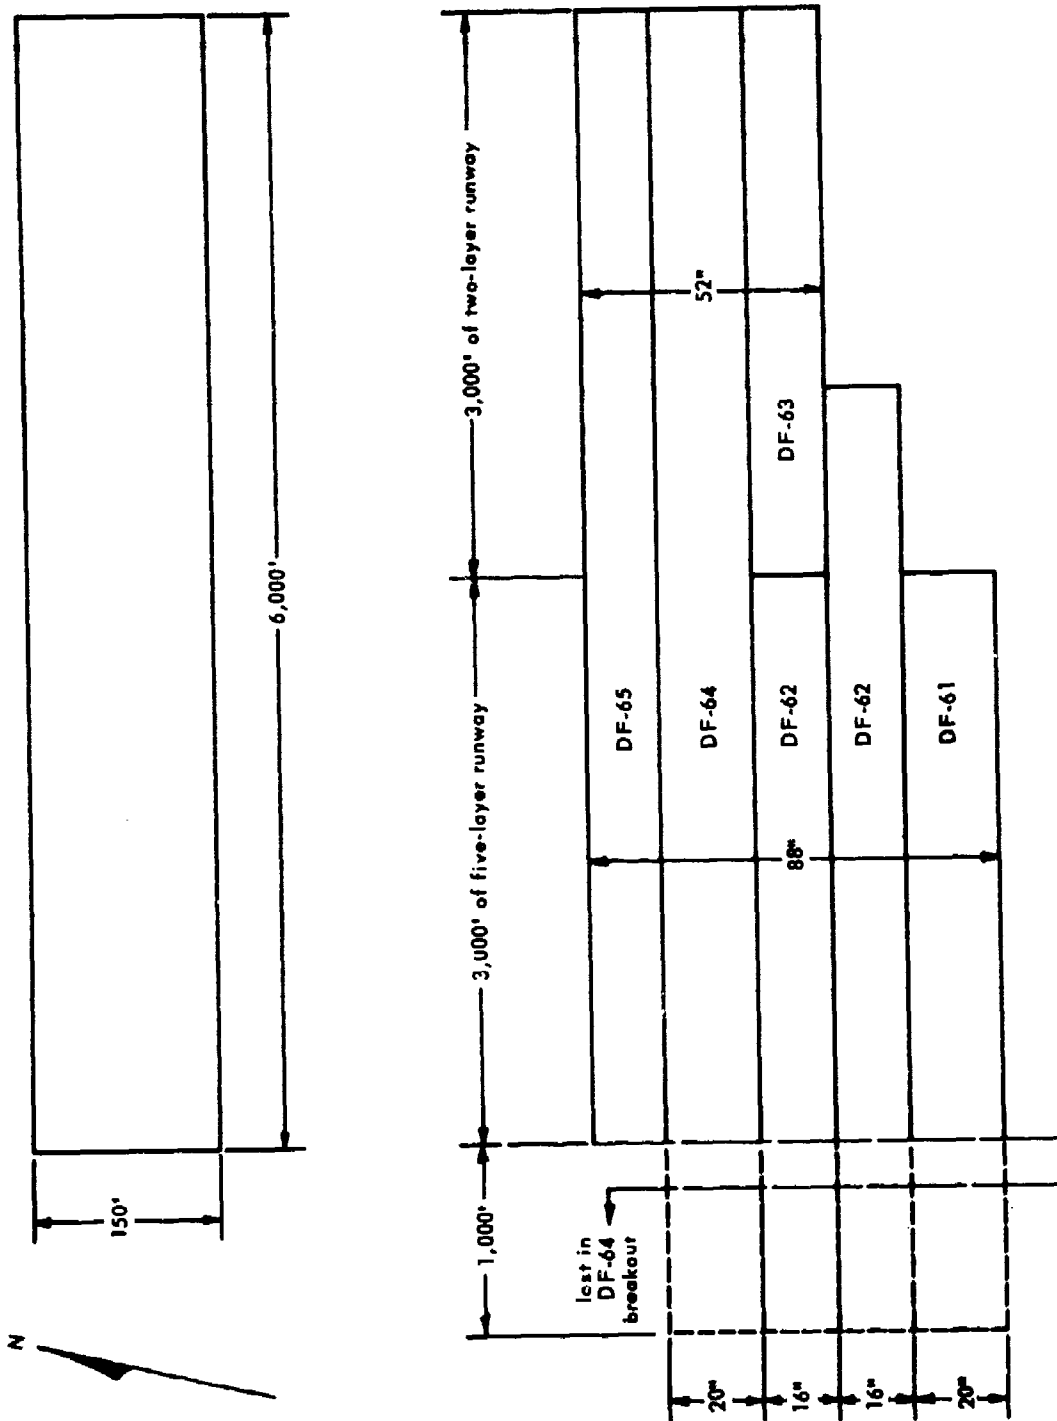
Longitudinal cross section and plan of the 10-70 test area for DF-65.
